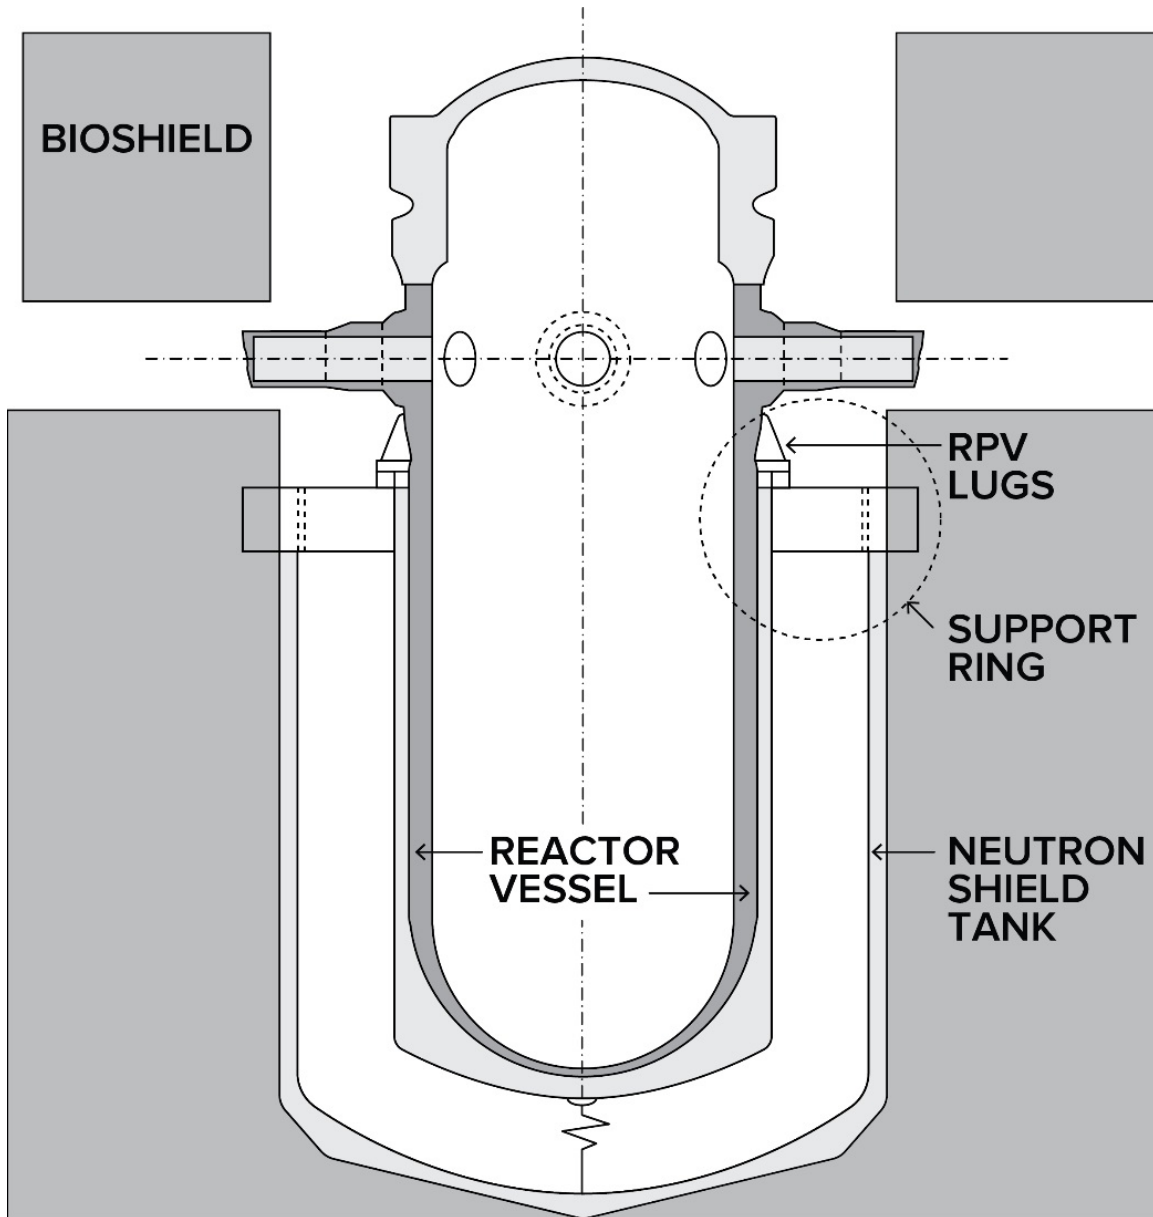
Examples of PWRs Supported by Steel Girders Embedded on the Biological Shield (Source: Lapay et al. [123])
